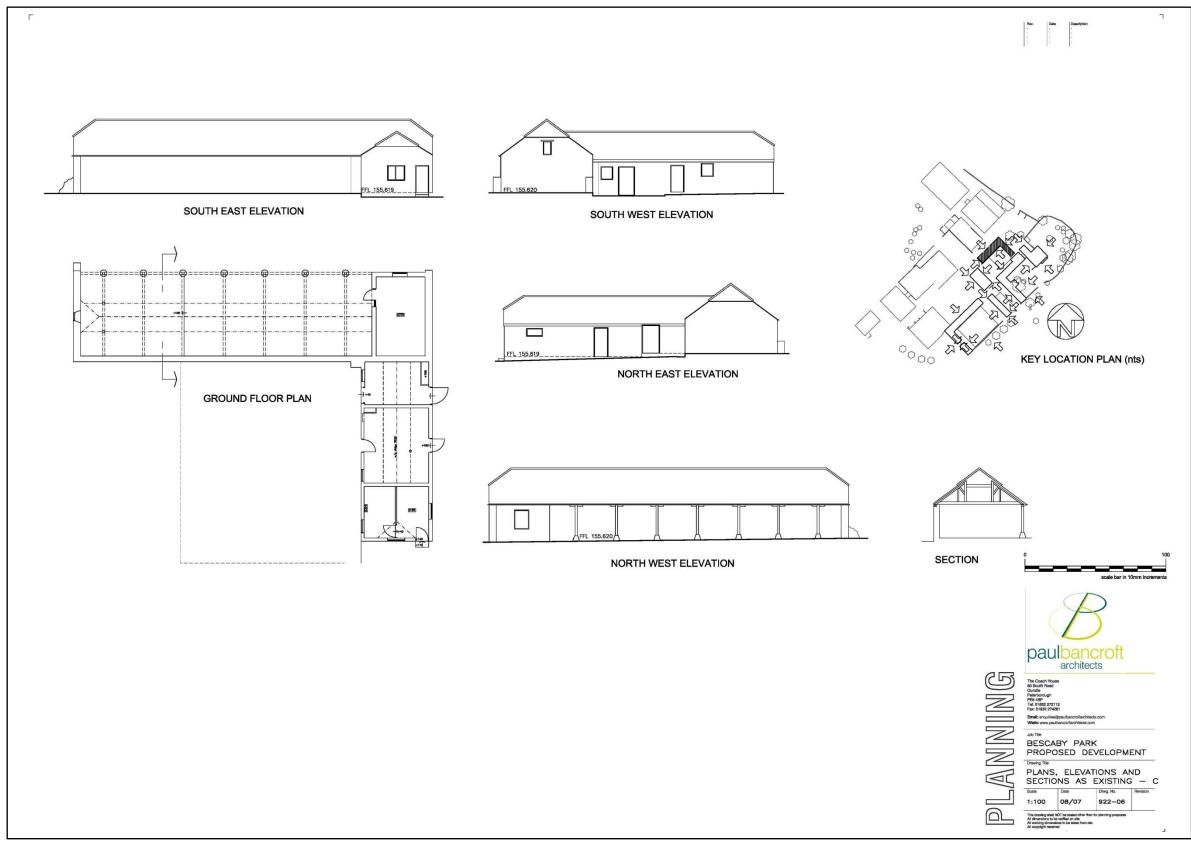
Cart/implement shed elevations and plans Source: Paul Bancroft Architects
